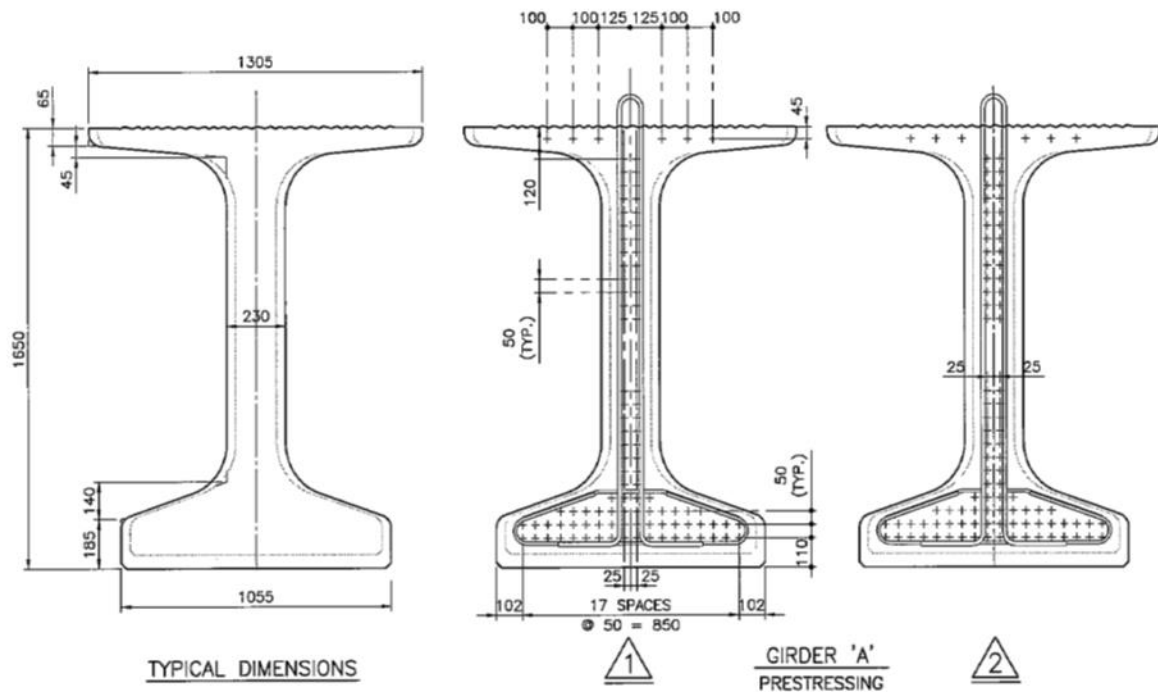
Typical dimensions and typical reinforcement of a girder from Tunnel T2
